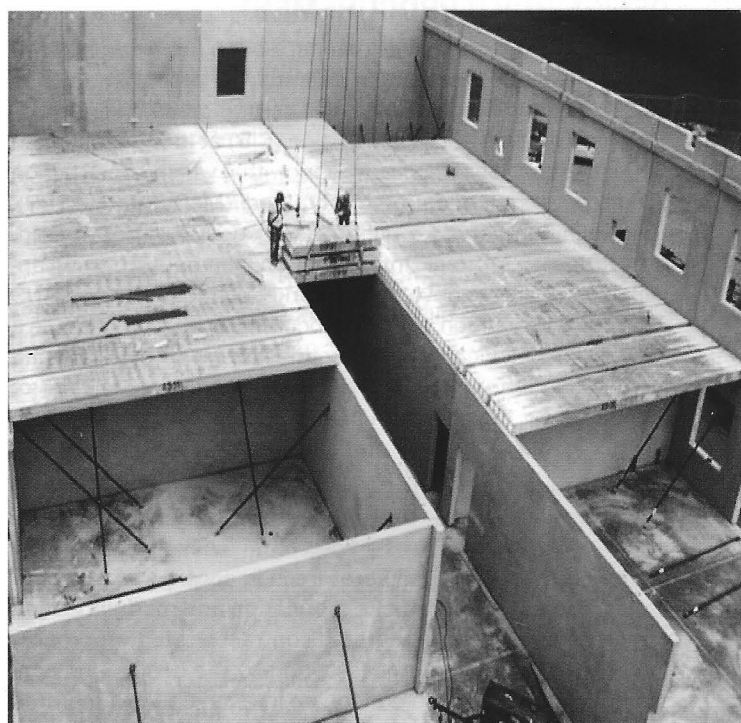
Precast wall panels and hollow-core floors during the construction of a school (Canadian Precast/Prestressed Concrete Institute, 2007).
